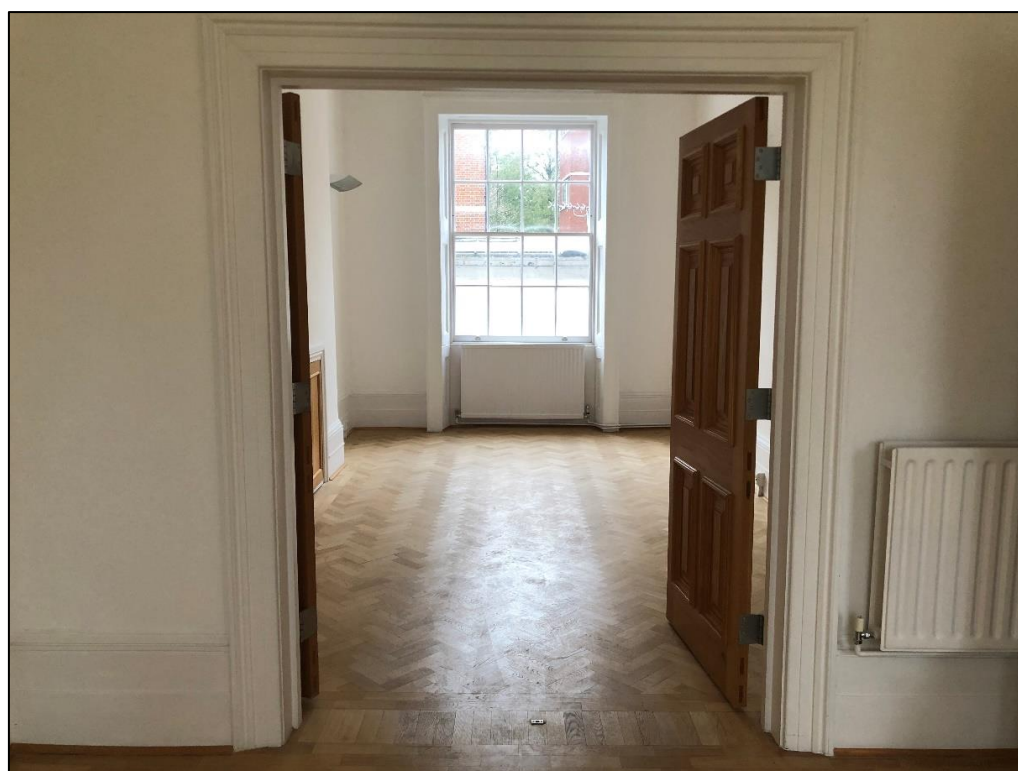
View looking W showing doorway between front and rear rooms on the first floor
